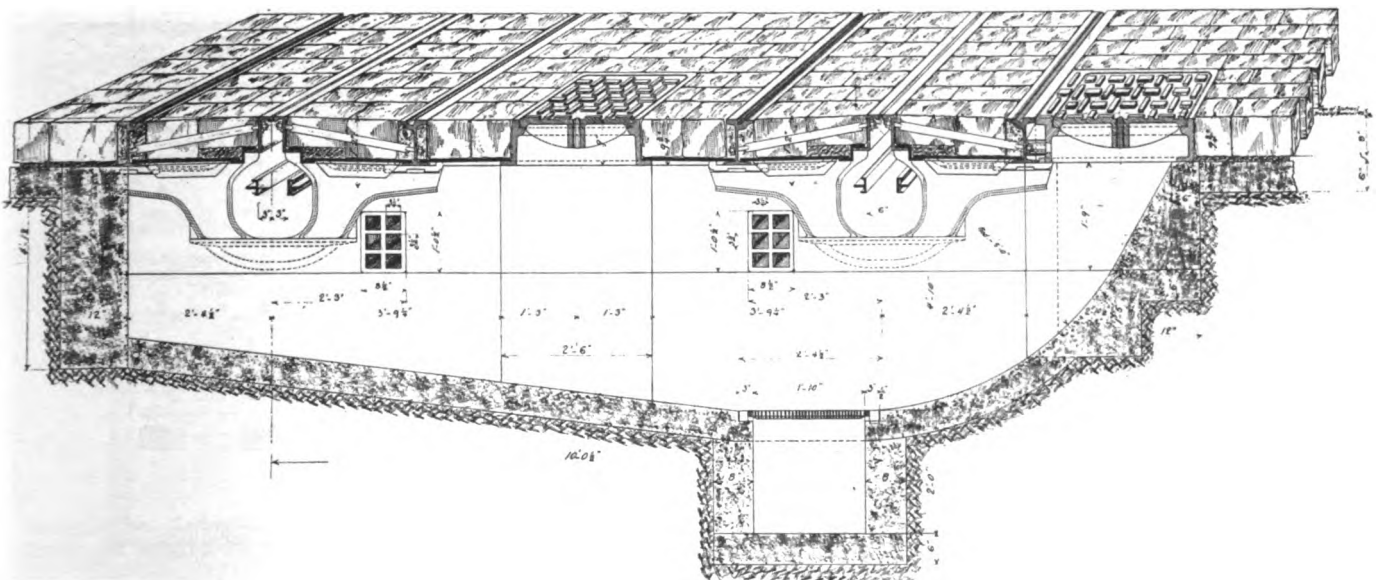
MAN HOLE AND CLEANING PITS, NEW CONDUIT ROAD CONSTRUCTION, NEW YORK.
